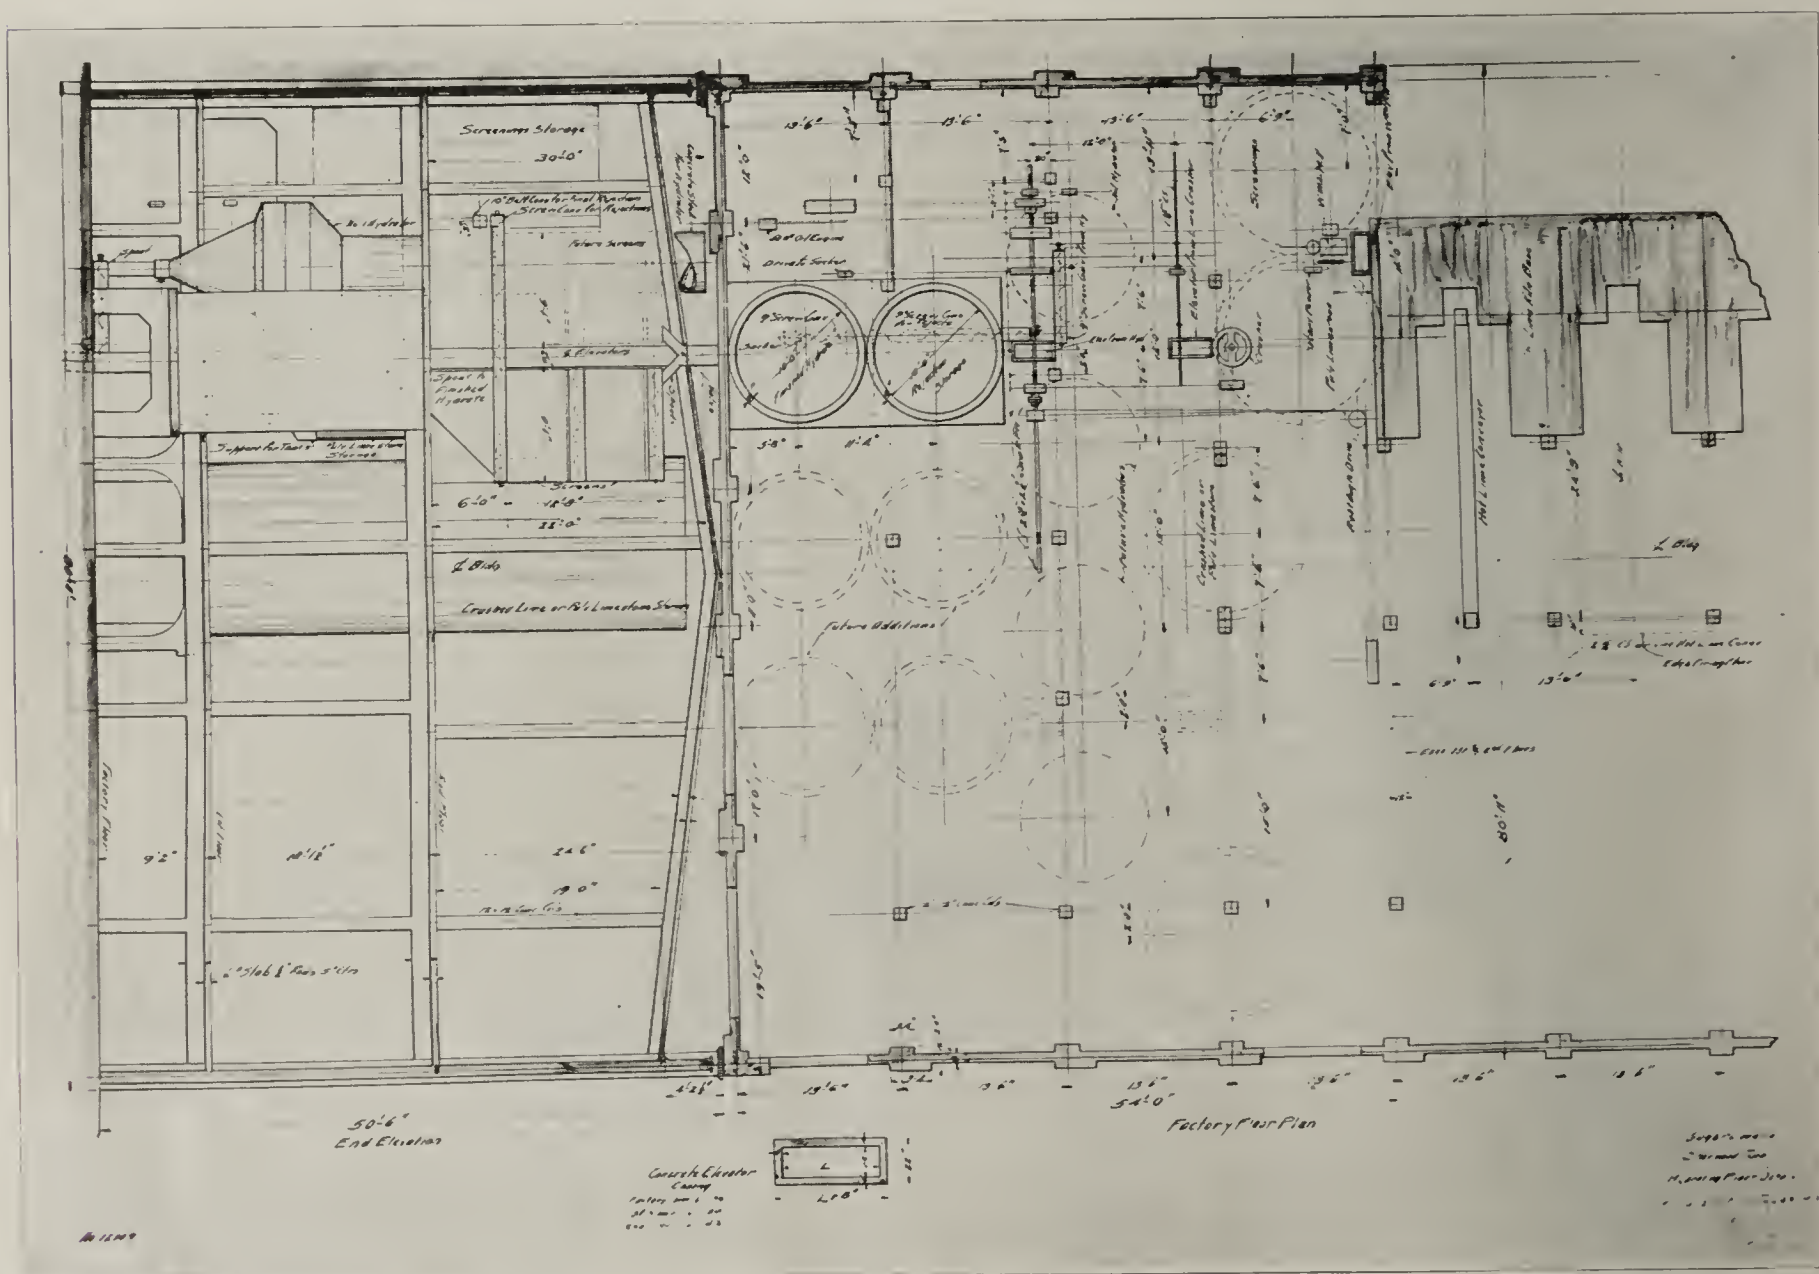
General Drawing of Hydrating Plant, Gager Lime and Mfg. Co.
